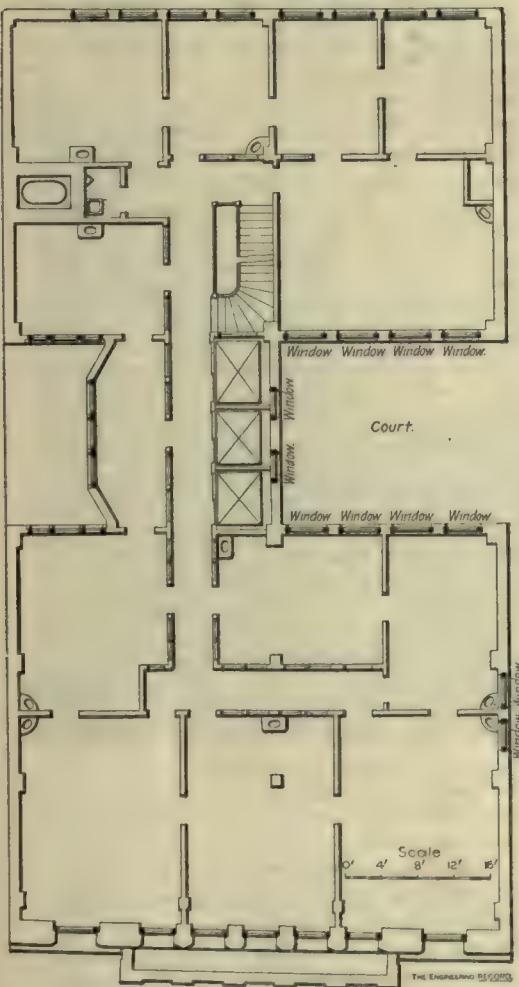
PLAN FROM NINTH FLOOR UP SHOWING LIGHT COURT.
